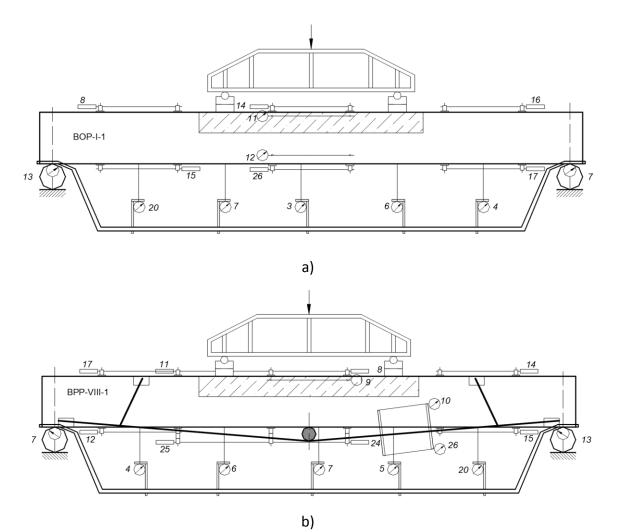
Scheme for testing a series of beams: a -- reinforced concrete beam BOP-I-1; b -- reinforced concrete beam BPP-VIII-1
